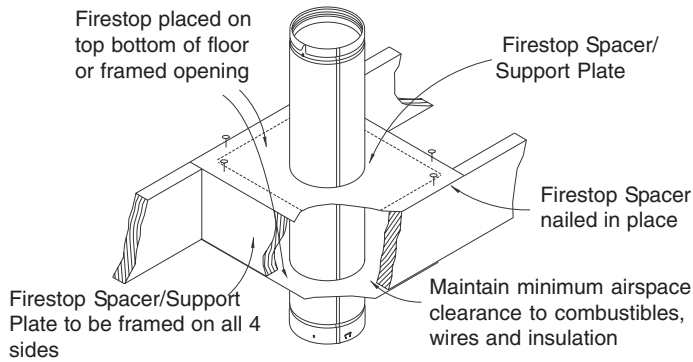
Fire Stopping Required at all Ceiling/Floor Levels
